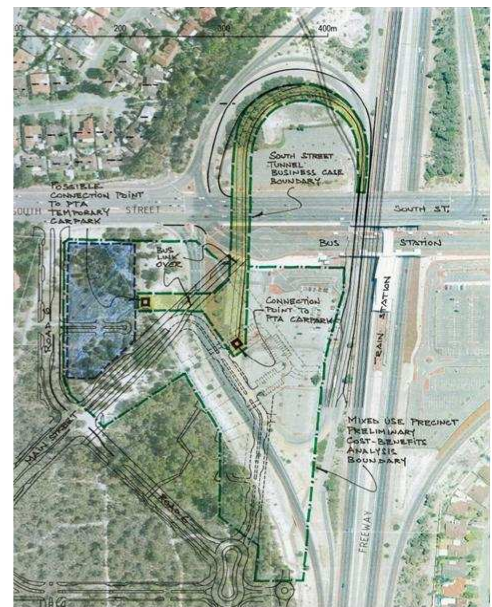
Fiona Stanley Hospital Site Showing “Mainstreet”
